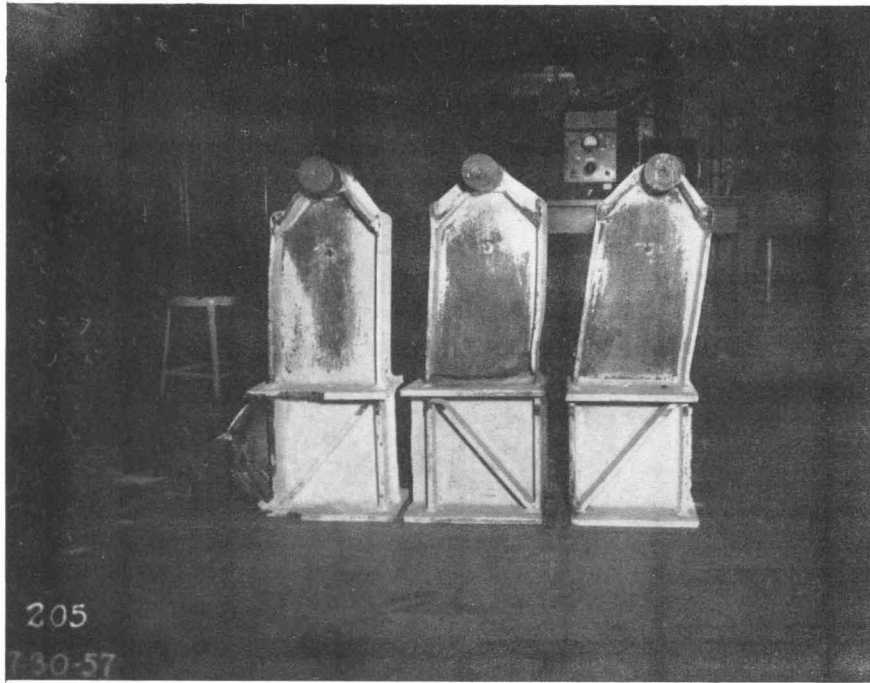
MODE OF FAILURE OF SPECIMENS
